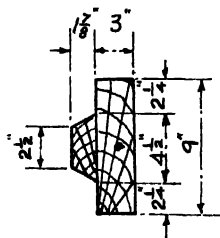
FORMWORK FOR T. AND G. JOINT
